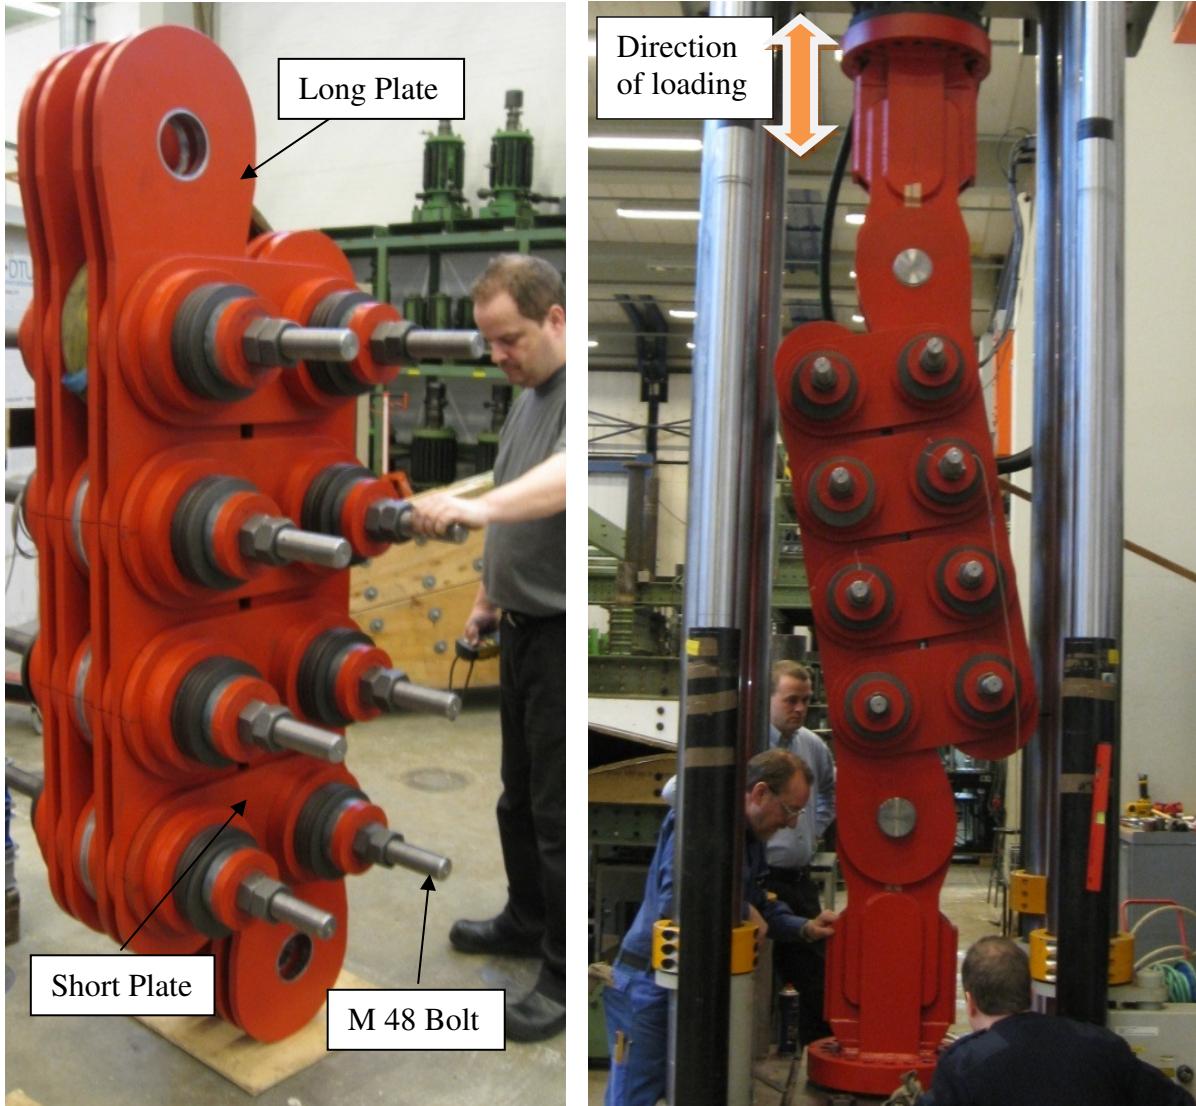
Left: 5000 kN damper. Right: 5000 kN damper installed in the testing machine.
